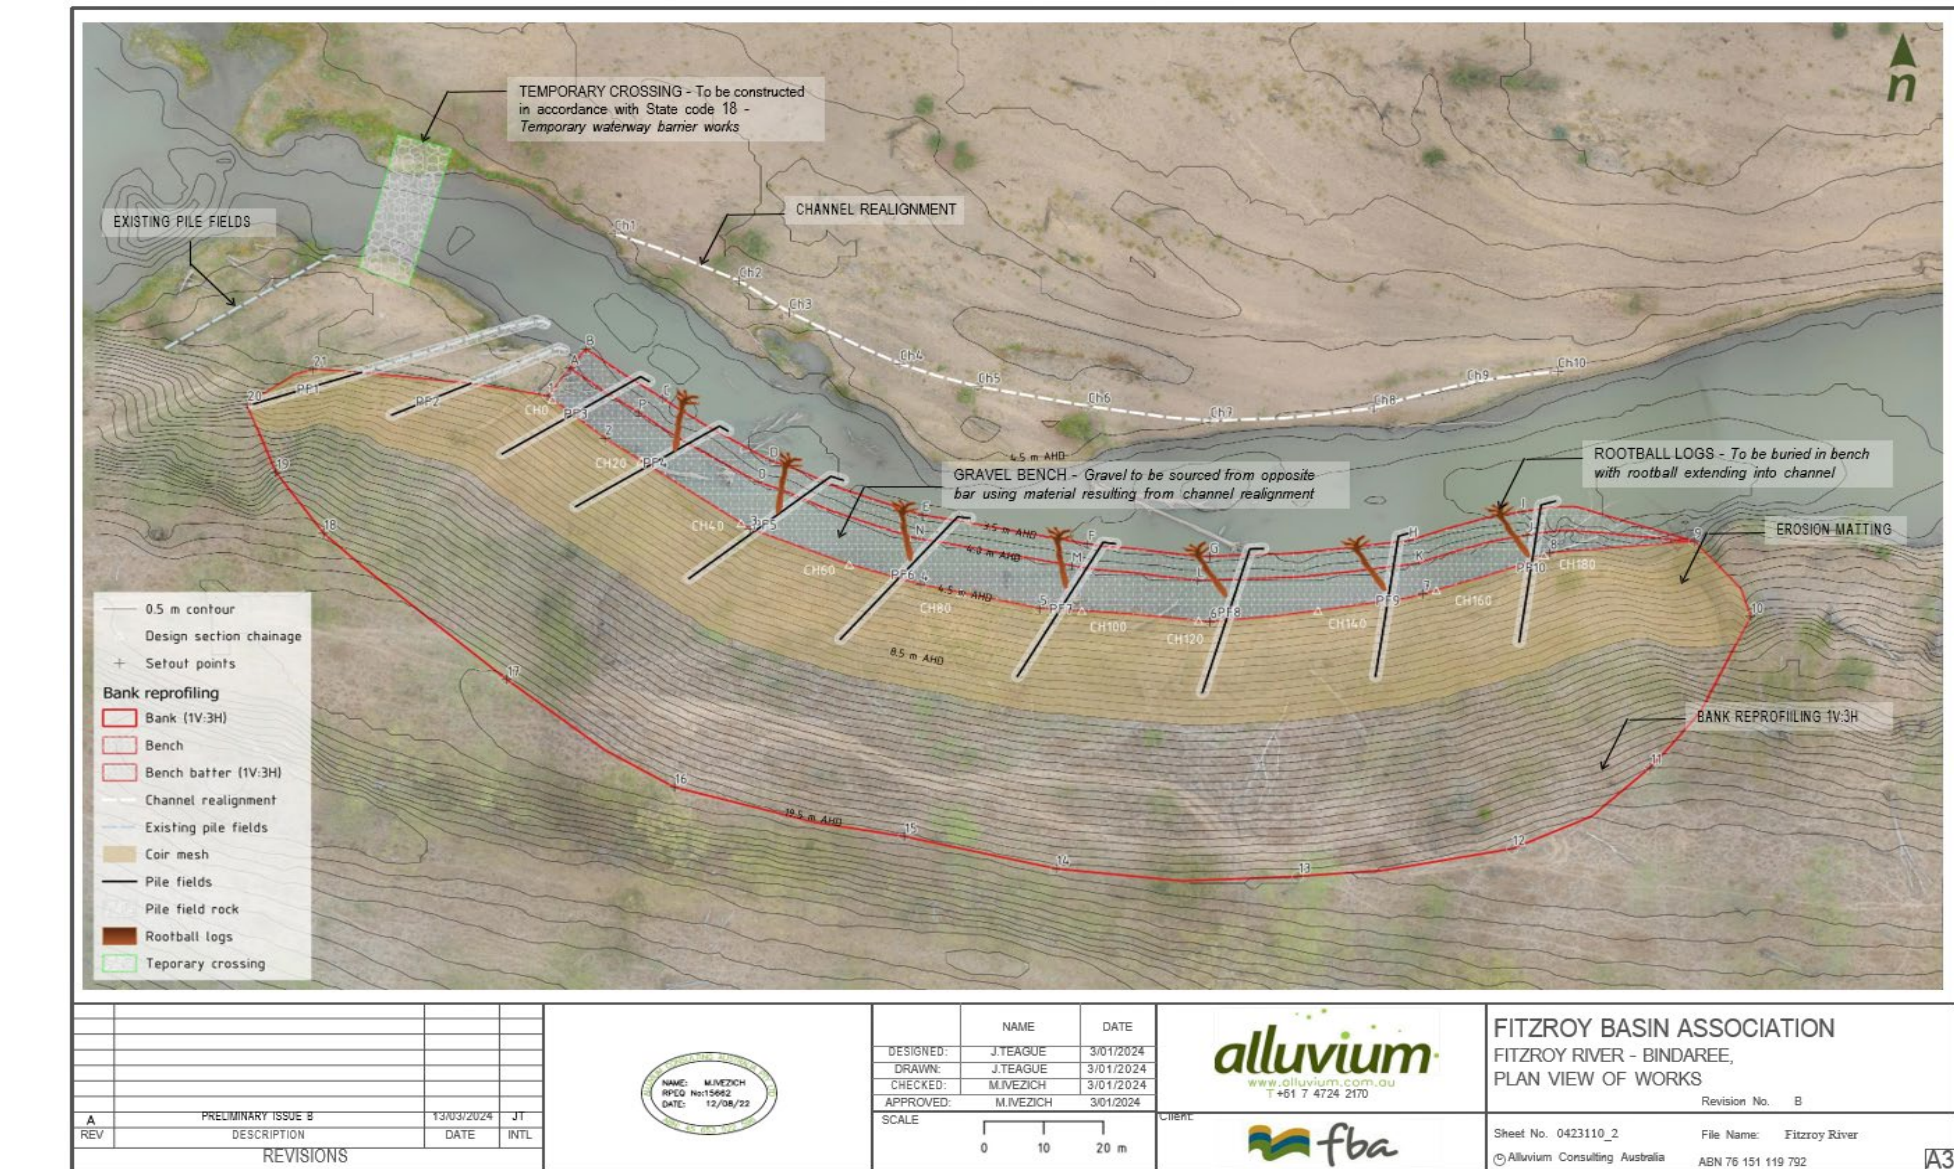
Site design plan view – Bank reprofiling, pile field installation, and revegetation
